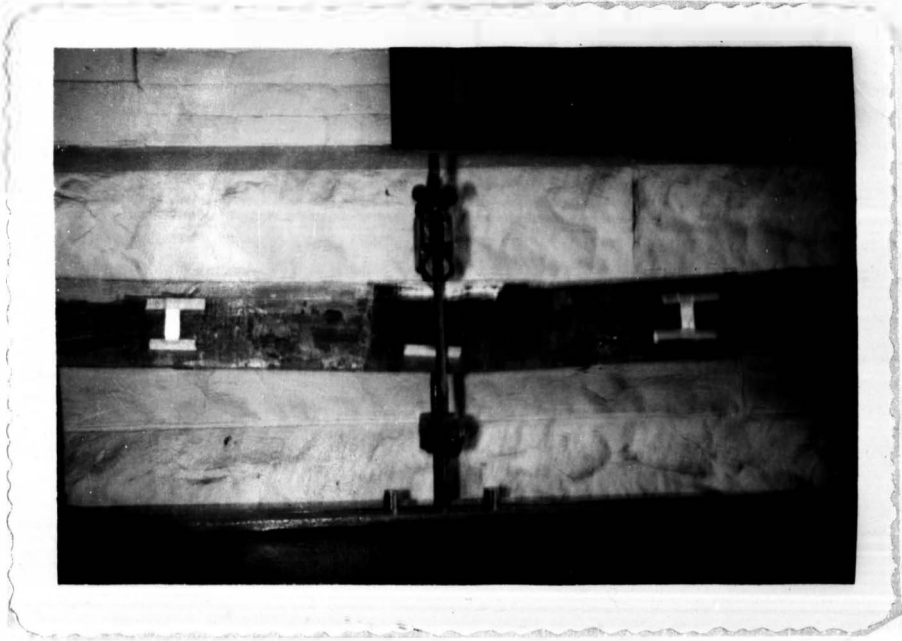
Beam Deflected Under Load. Note crack at right of loading yoke. Crack closed when load was reduced in spite of partial crushing of concrete in top of beam.
